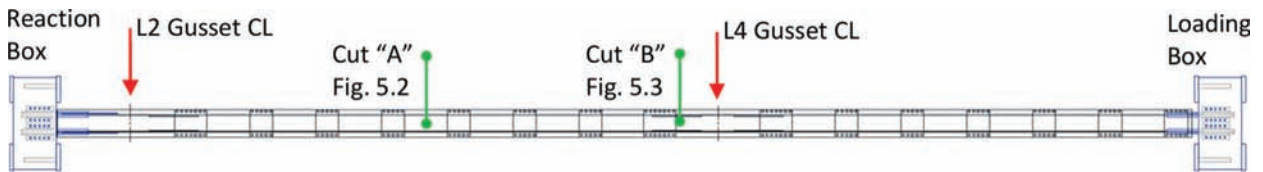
Plan view sketch of Winona Bridge Specimens showing locations of the member cuts.
